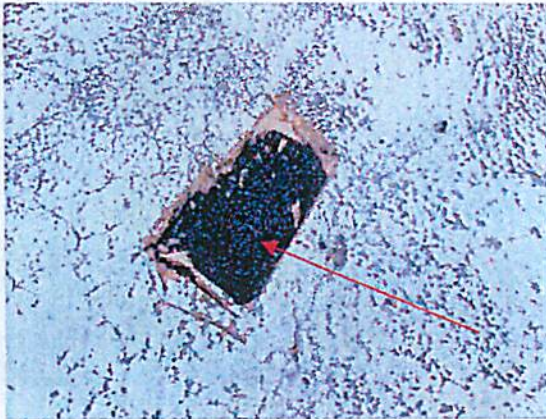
View of built-up roofing (HA-M) under spray foam on the roof.
